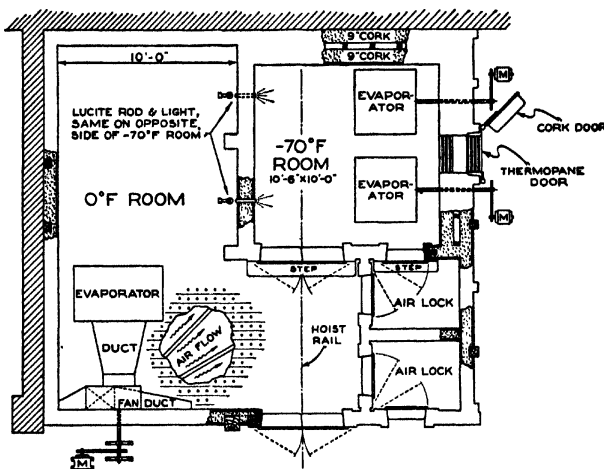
Plan view of 0°F and -70°F laboratory rooms, showing arrangement of equipment and facilities.
